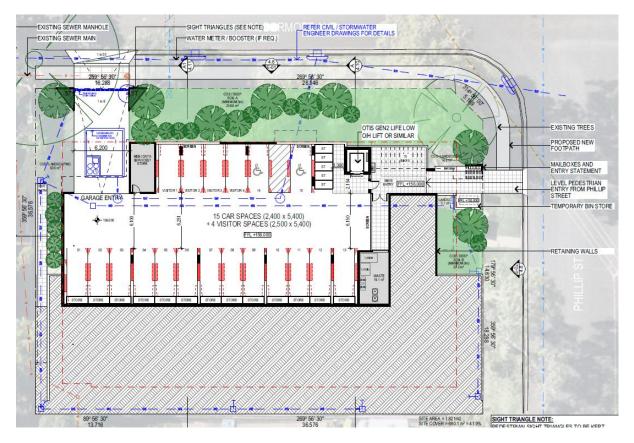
| Proposed development ground floor plan, Source: Raunik Design Group
